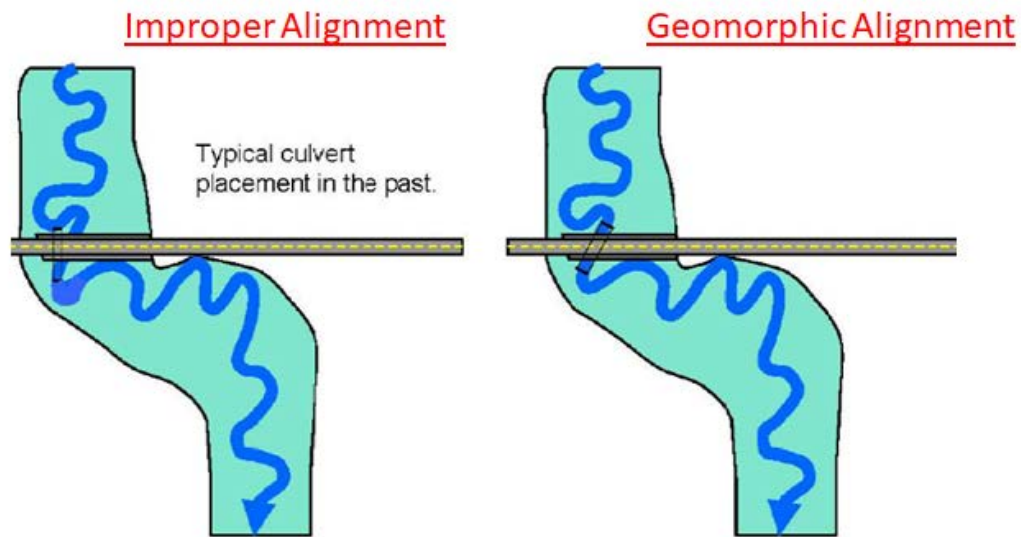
Improper and Correct Crossing Alignment (adapted from MDNR, 2008)
